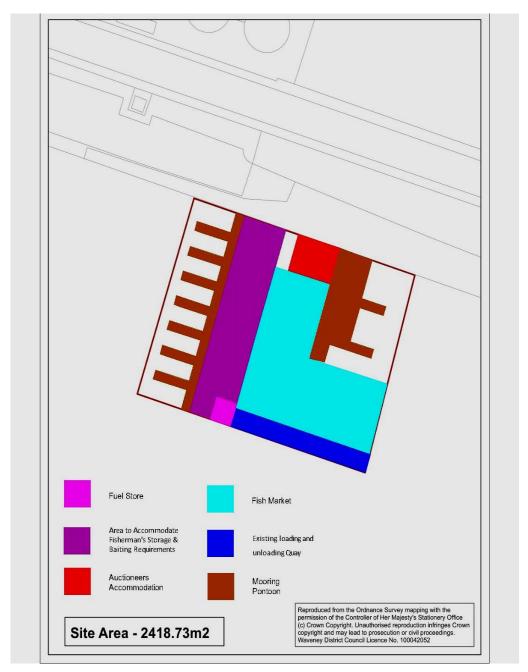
Site A - Hamilton Dock - Pontoon - Option 2
